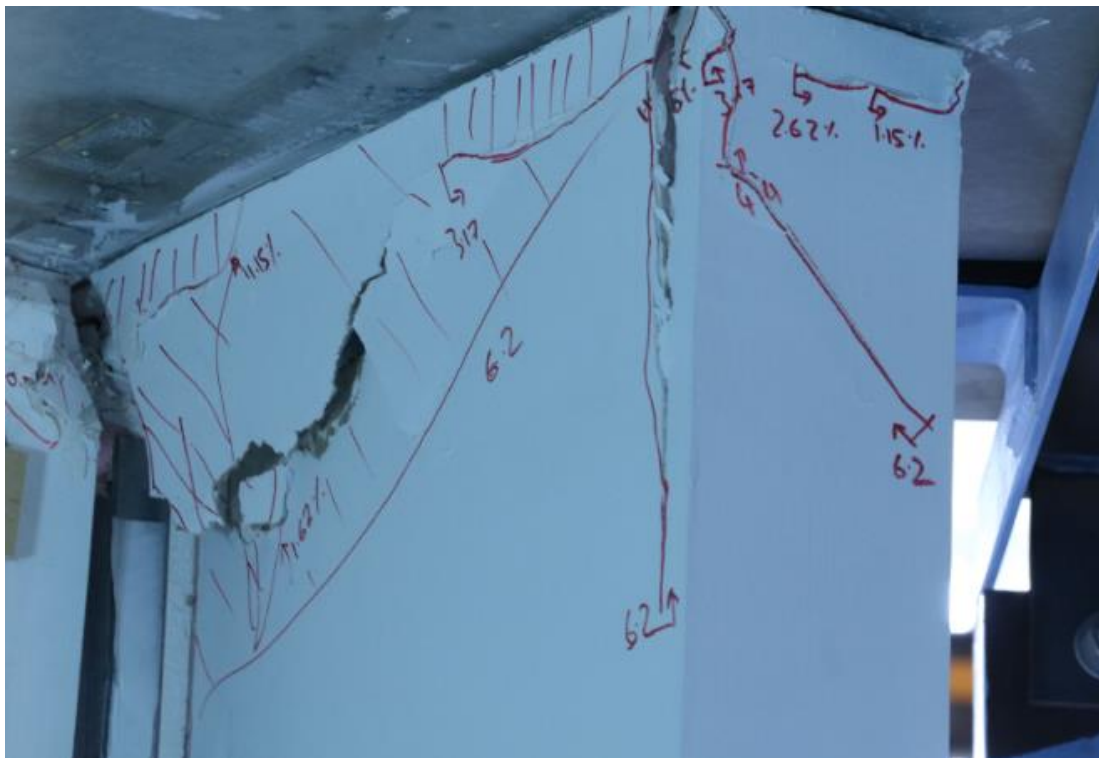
Specimen B1 – Step 16 –linings spalling – location 9 to 11
